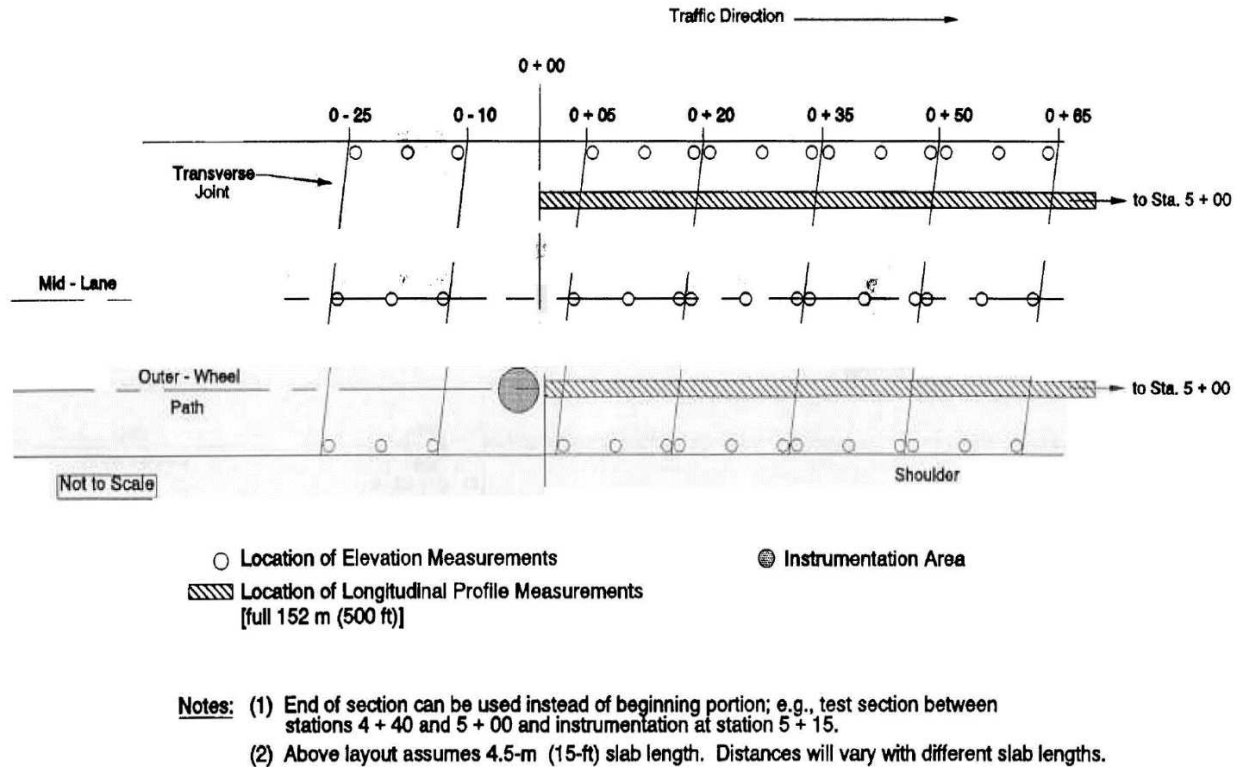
Elevation and Profile Data Collection Plan – JPCP Pavements [5]
